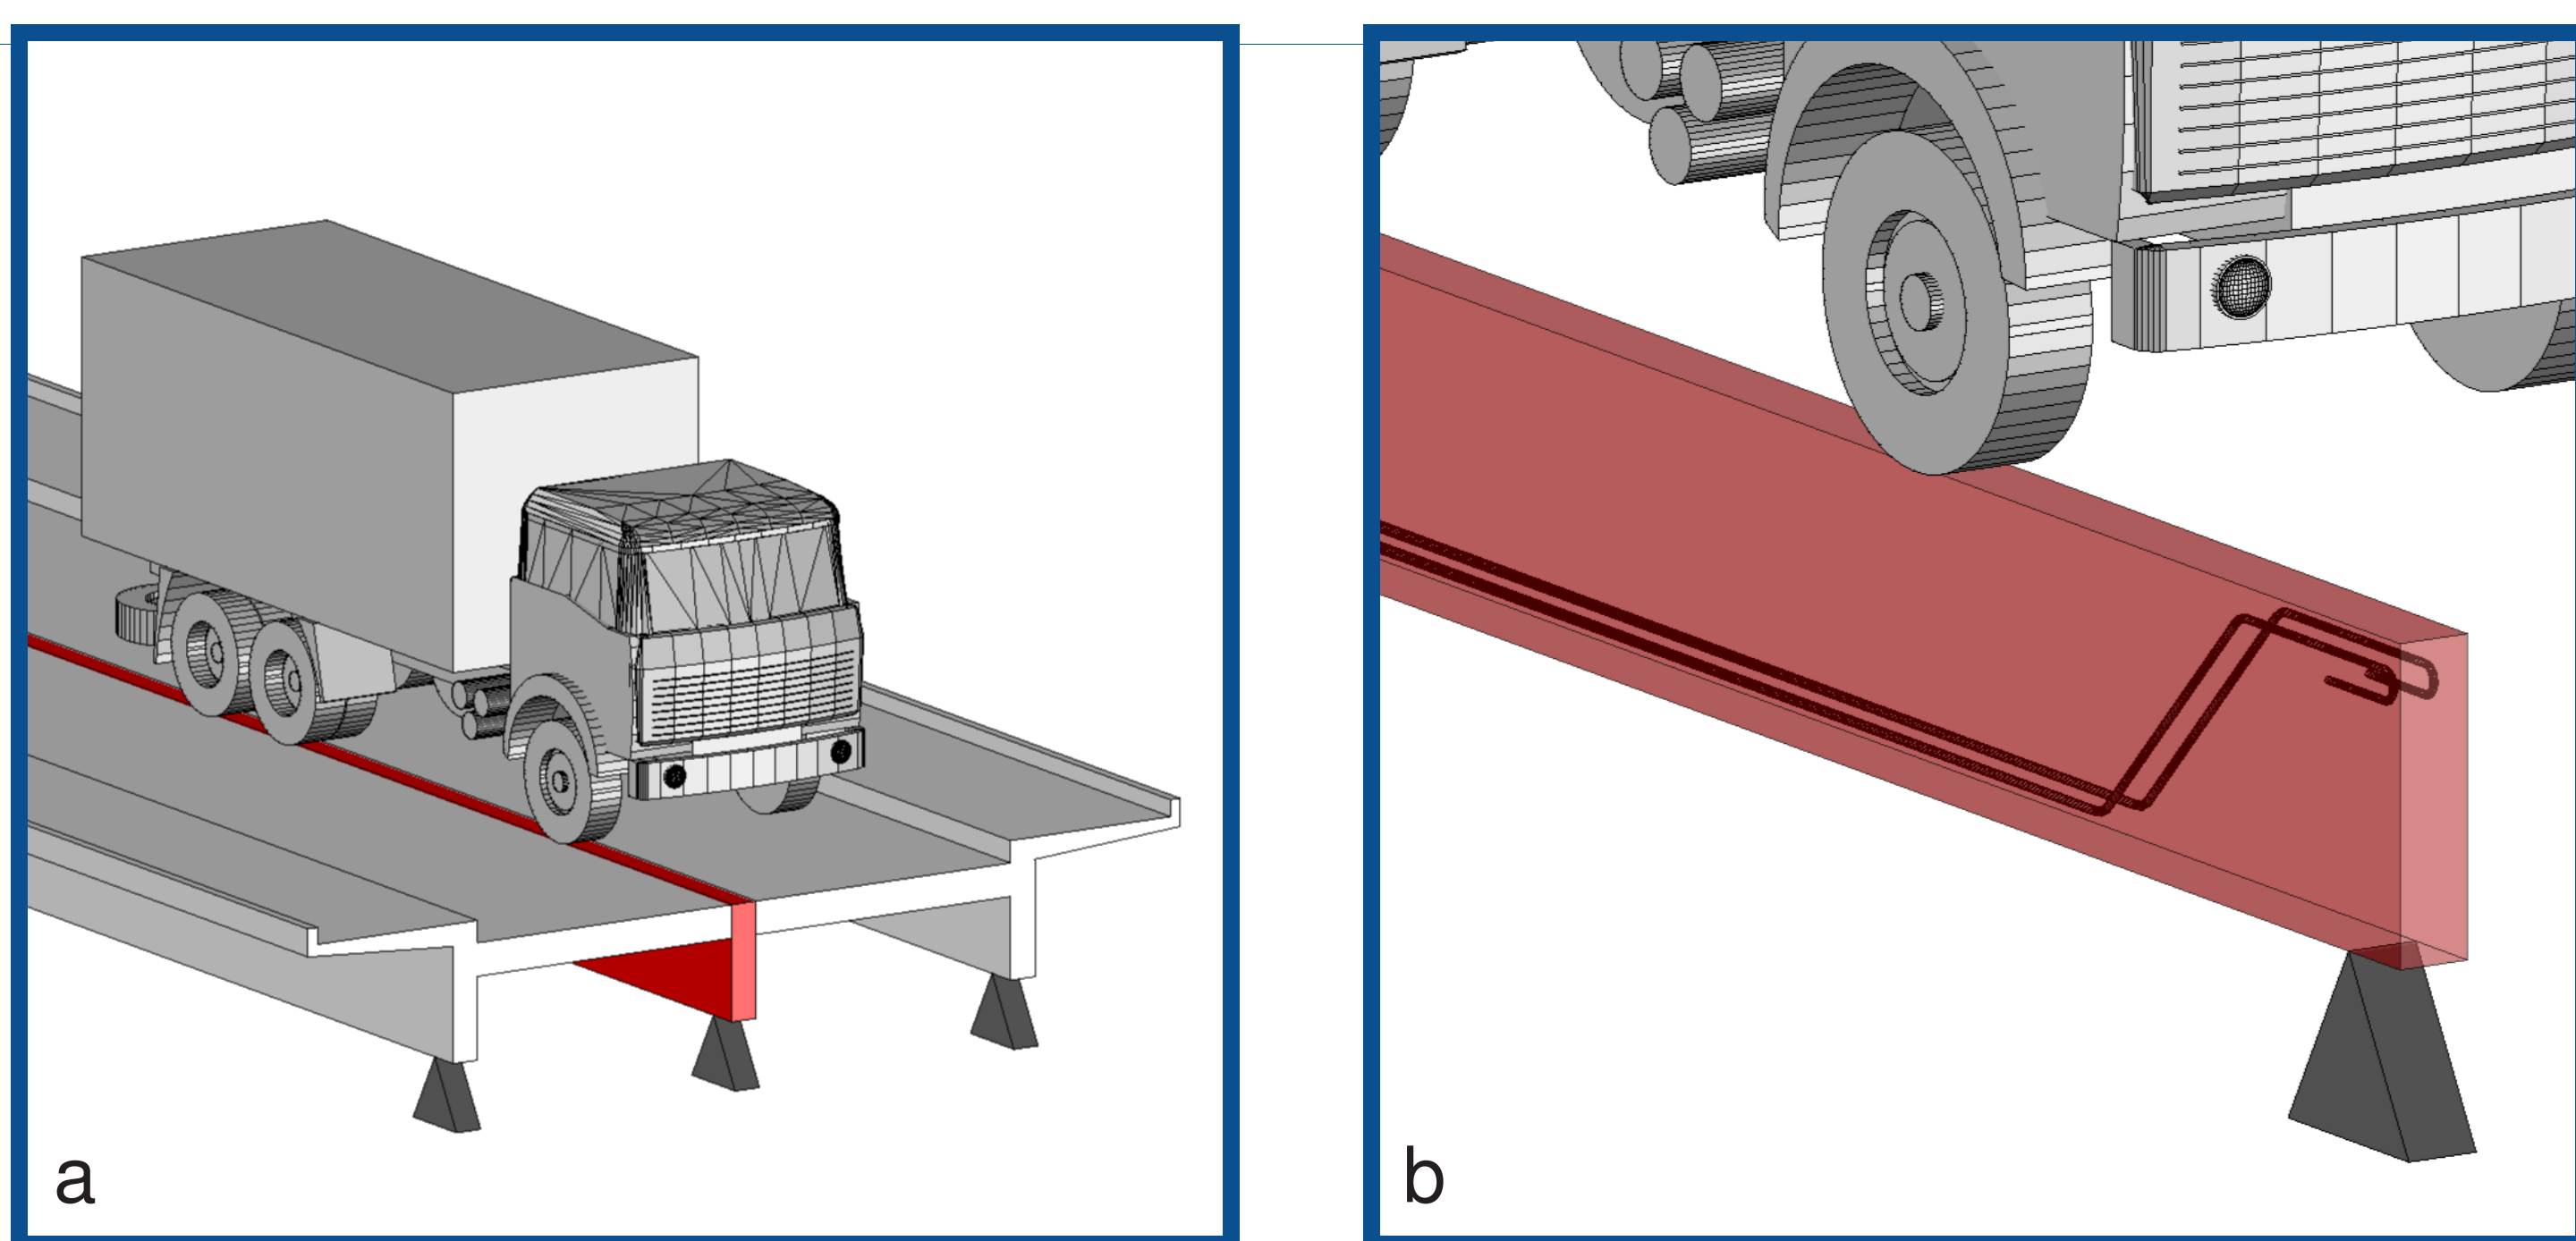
A truck passing a bridge with longitudinal beams. 1b: A closer look at the beam, showing a reinforcement design using bent-up bars.
